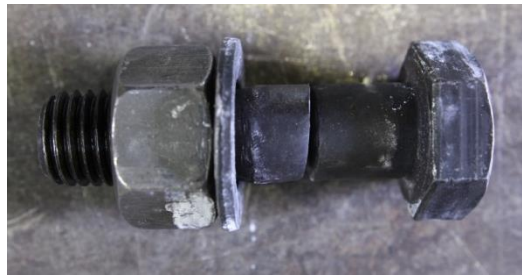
Rupture due to bolt shear (Specimen 3)
